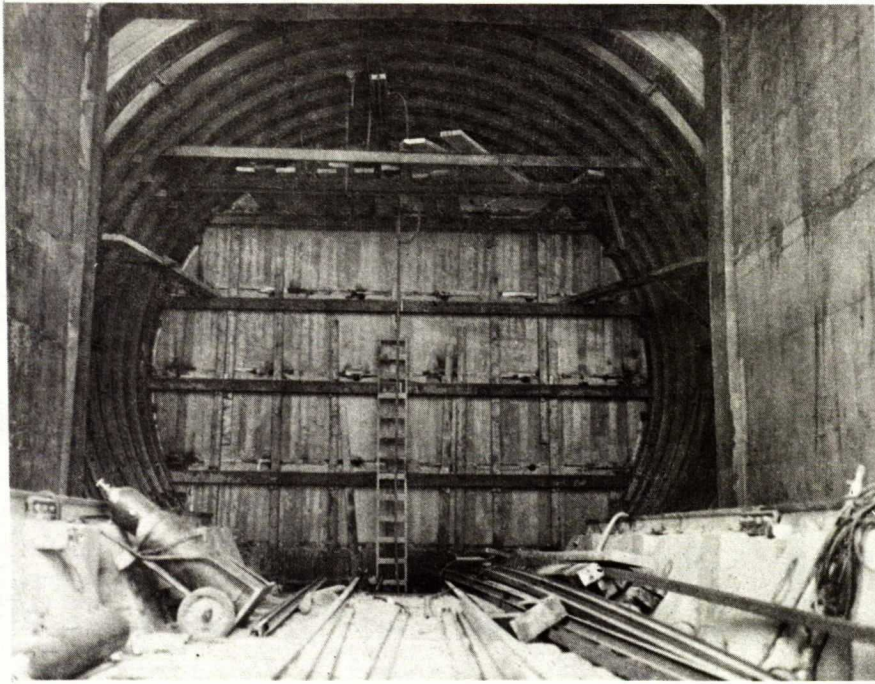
The grout face in an upstream tunnel portal, with timber lagging removed.
